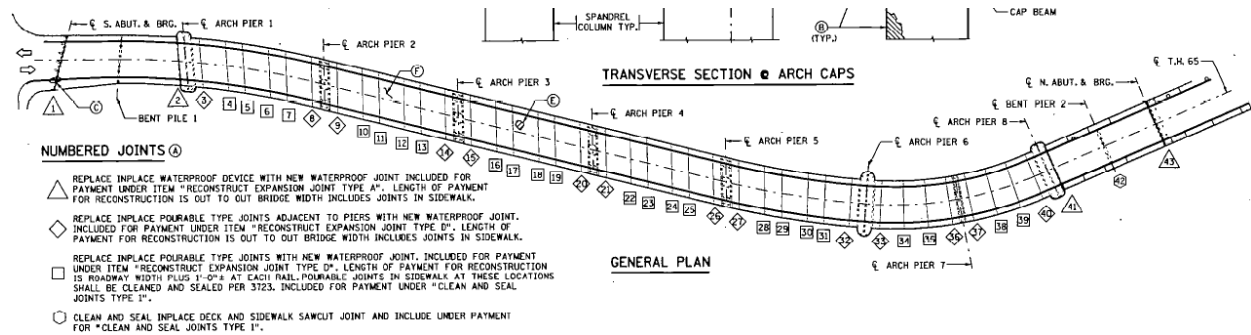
General plan of bridge deck showing 2003 deck joint locations and numbers (excerpted from 2003 joint replacement drawings).
